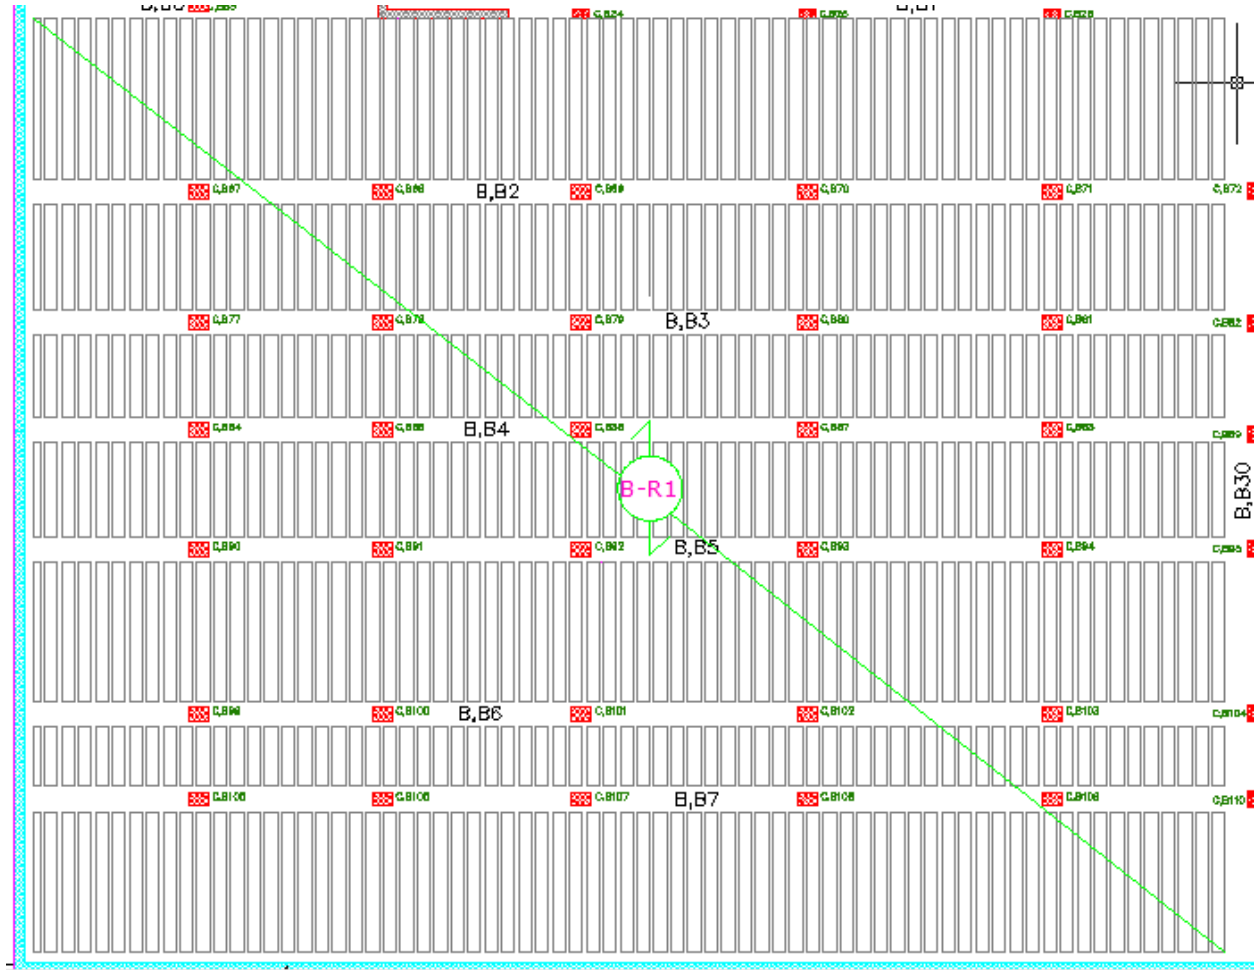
location of Rib (B-R1) in slab drawing plan.
